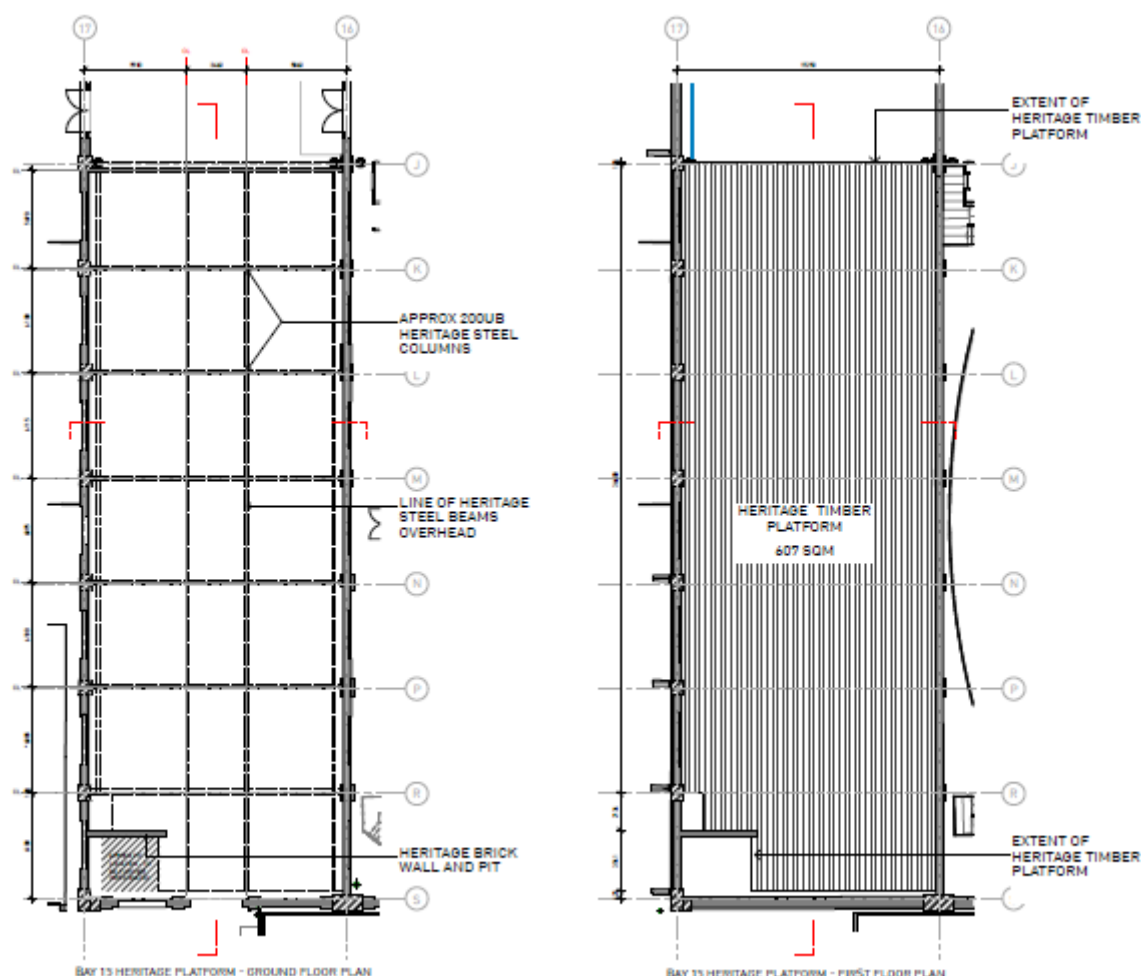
Ground Floor and Level 1 Plans of Bay 15 South illustrating the extent of the mezzanine platform and location of the brick pit and adjacent brick wall
